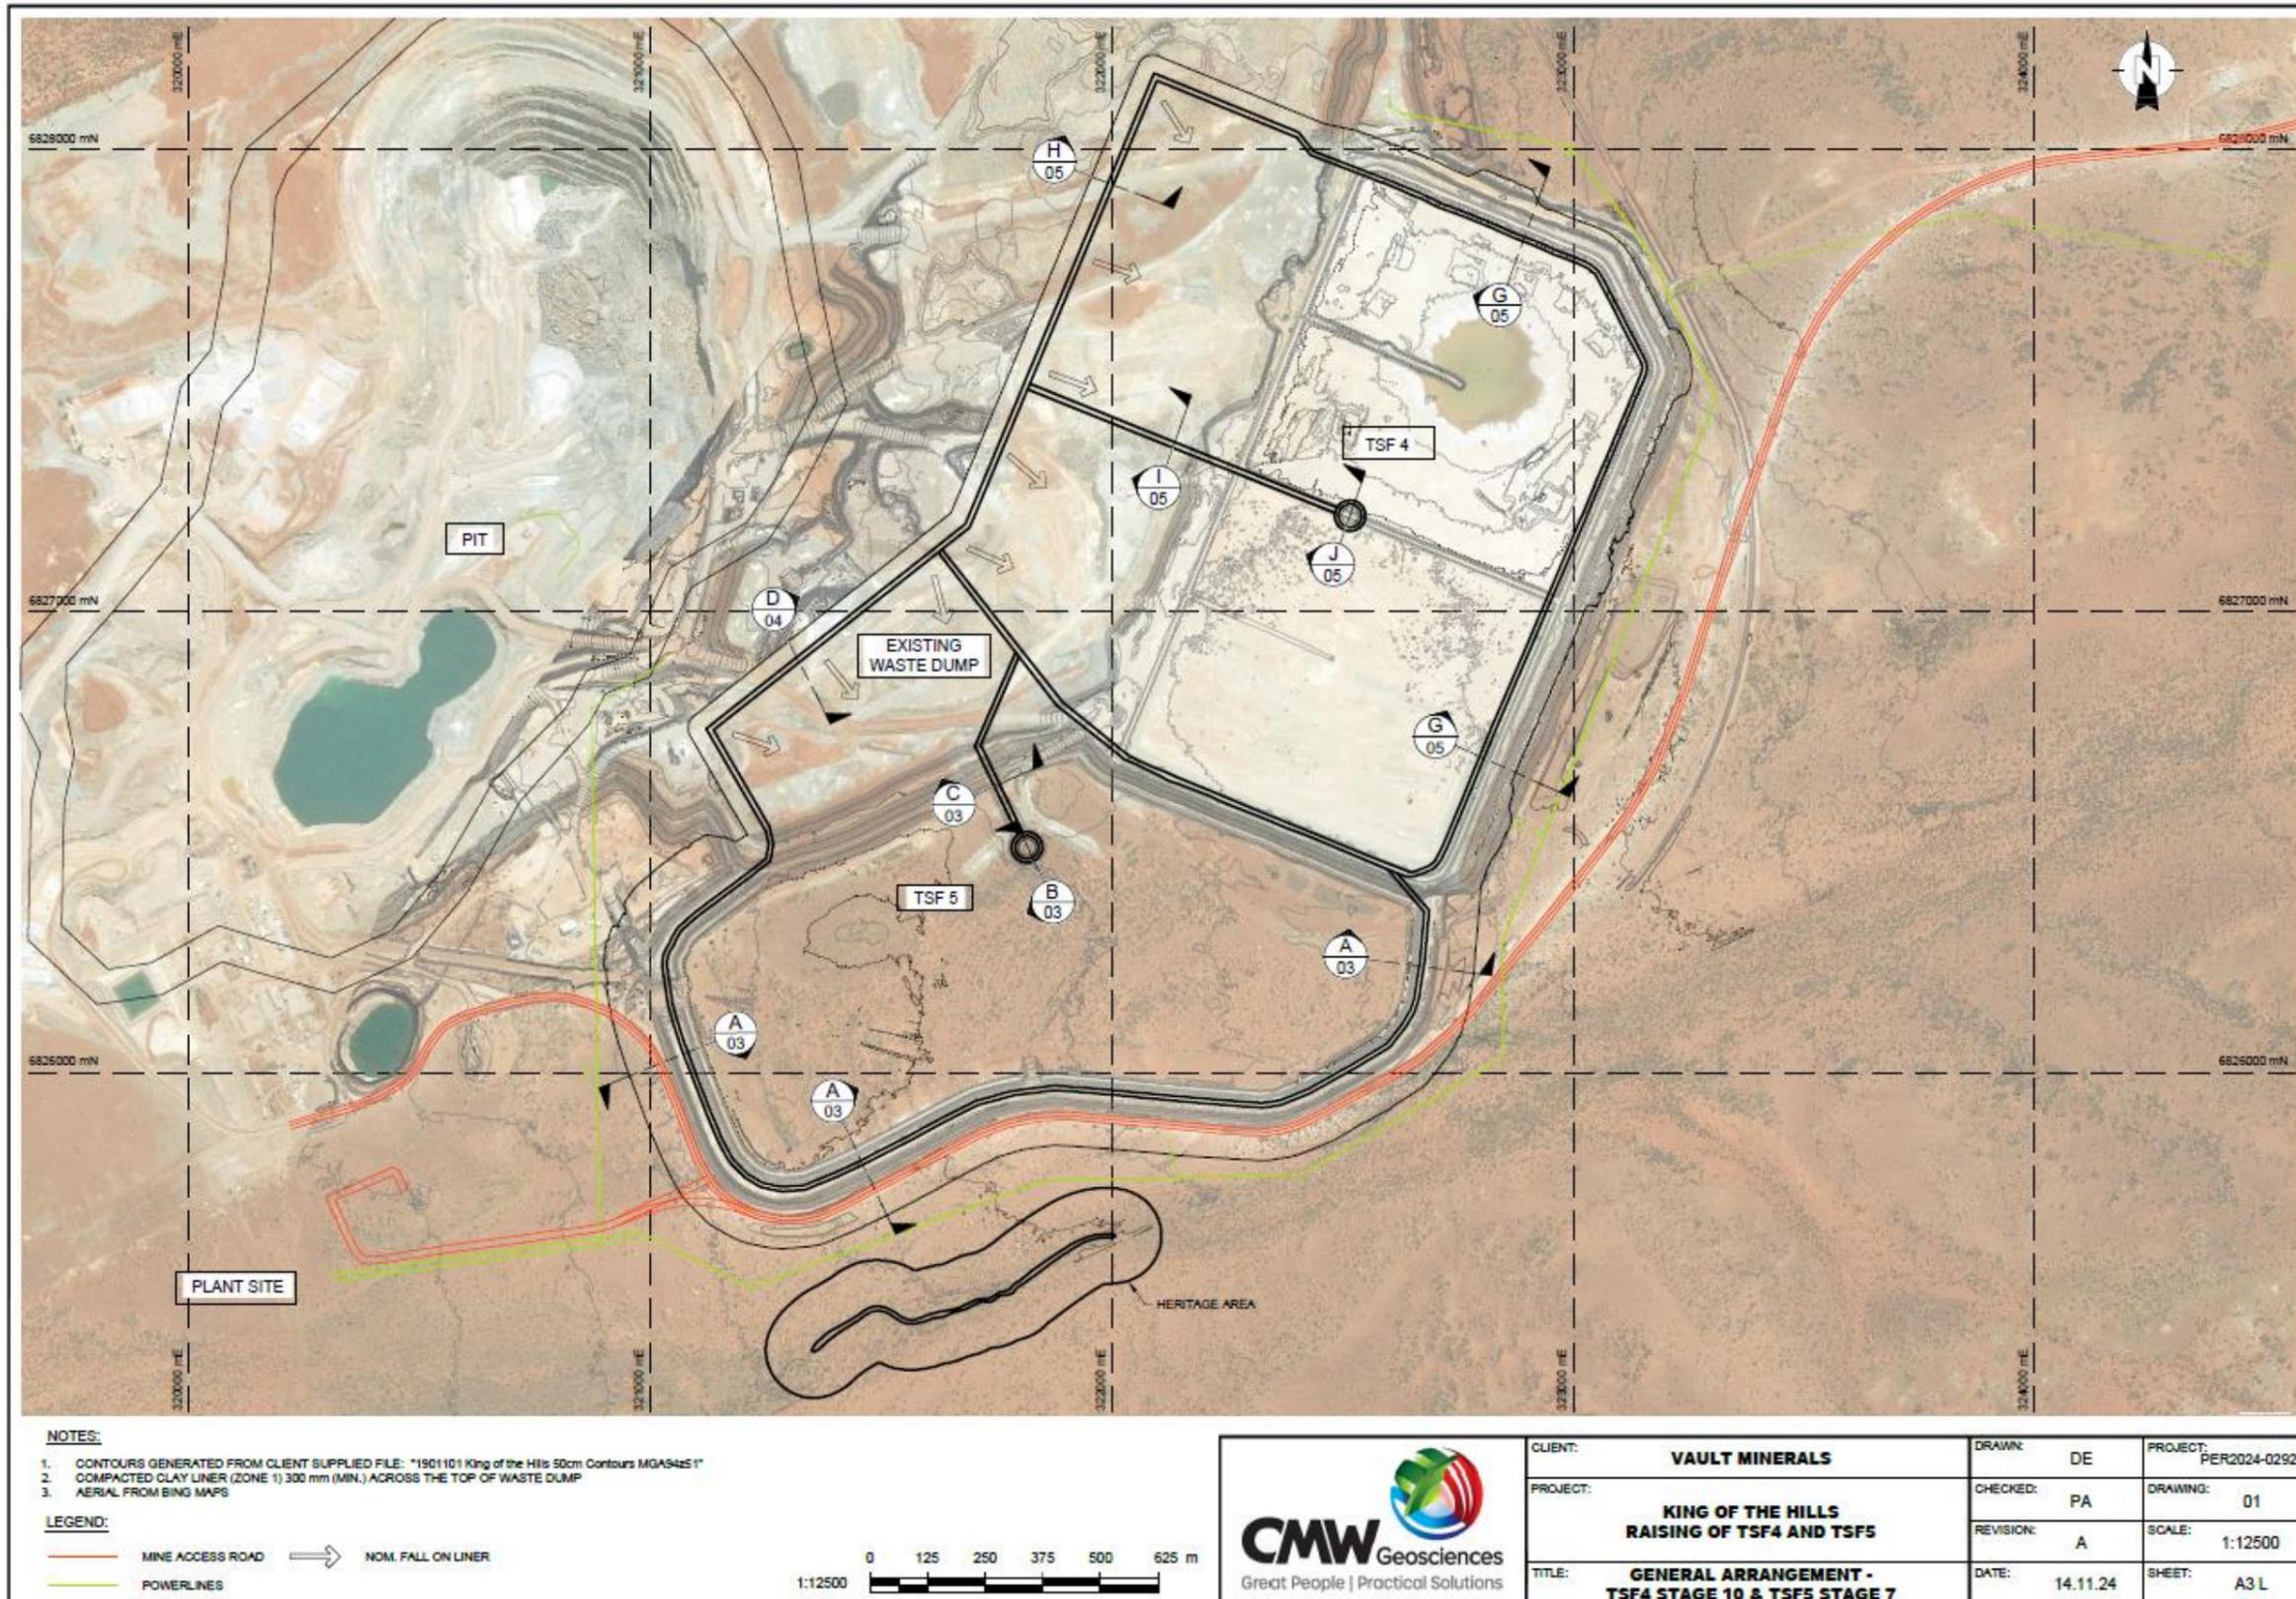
General arrangement – TSF 4 Stage 10 and TSF 5 Stage 7
